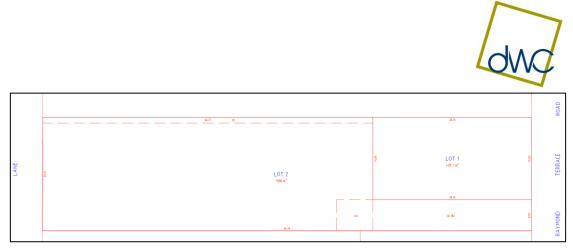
Plan of proposed subdivision. (Source: de Witt Consulting)
